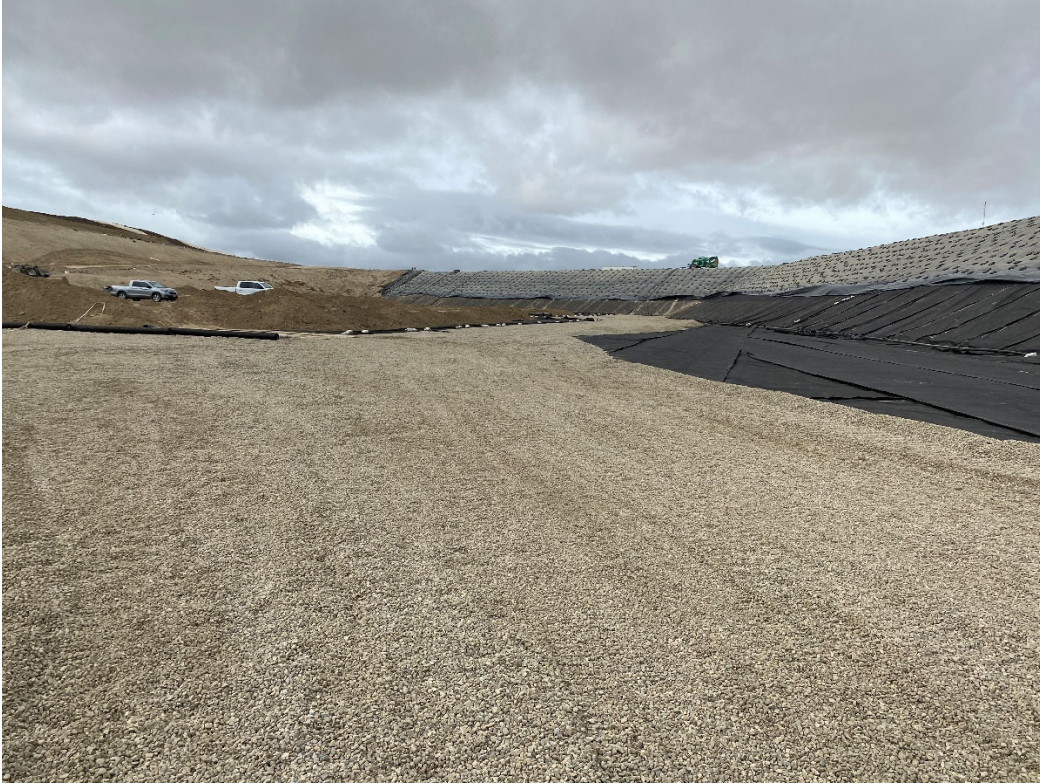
Verified liner system components, geotextile, gravel layer, soil operation layer, and ballast.
